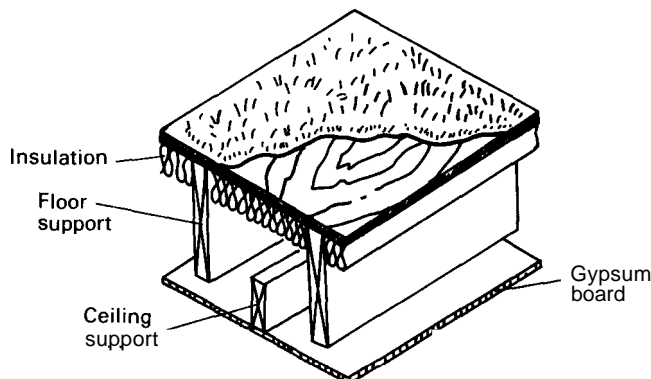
A floor-ceiling structure having carpet, pad, plywood subfloor, and ceiling gypsum board supported on separate ceiling joists has an STC rating of 51 when 2 to 3 inches of insulation are installed beneath the plywood subfloor.
